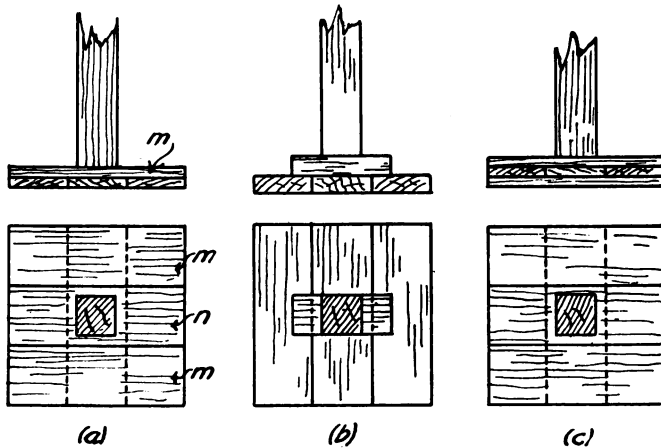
TYPES OF DEFECTIVE FOOTINGS.
